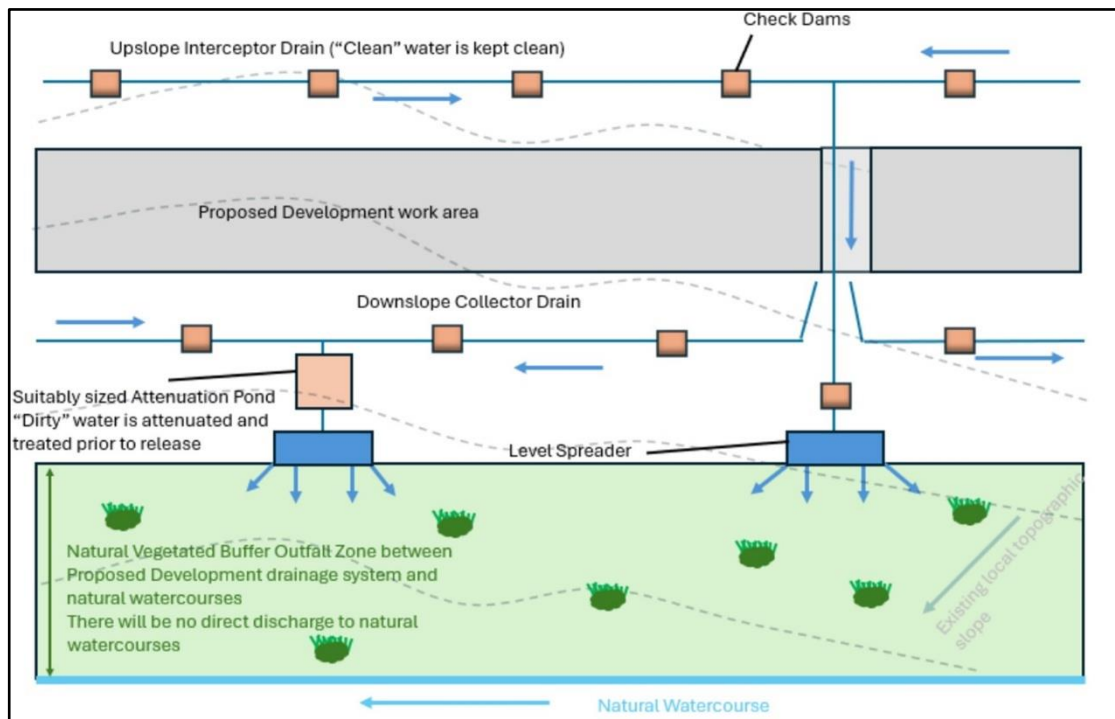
Schematic of Proposed Wind Farm Drainage Design
